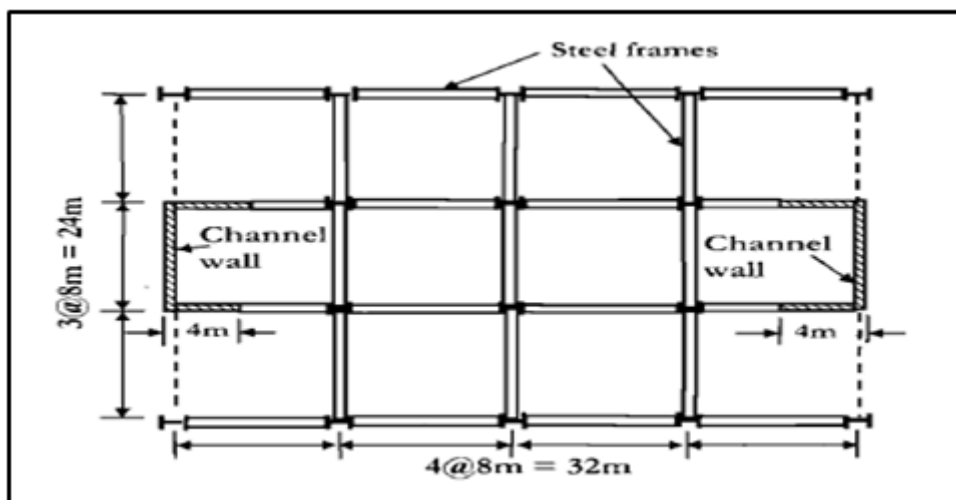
Plan View for the Studied Dual Frame-Wall Buildings
